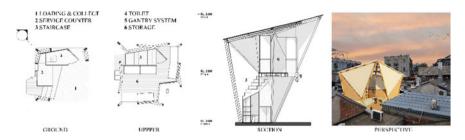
Ternary Shed, drawings and perspective of warehouse layout
